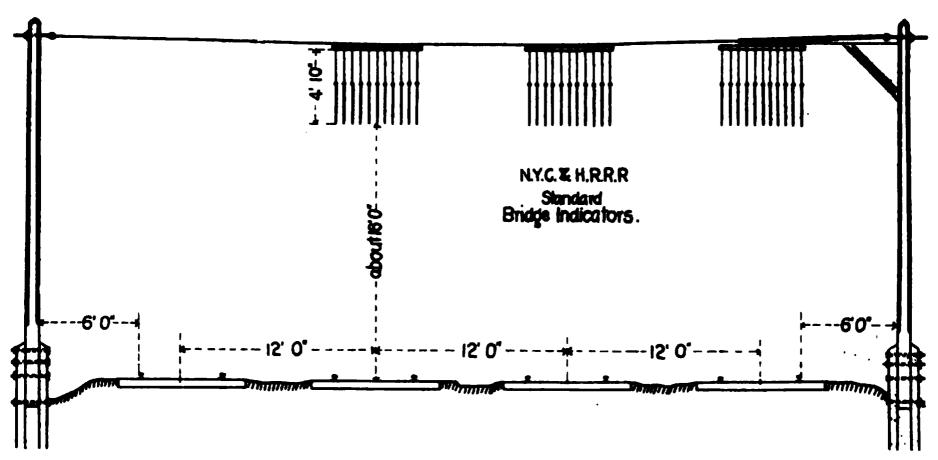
Bridge Indicator, New York Central & Hudson River Railroad. (Plan No. 5, Committee Report on "Bridge Warnings.")
